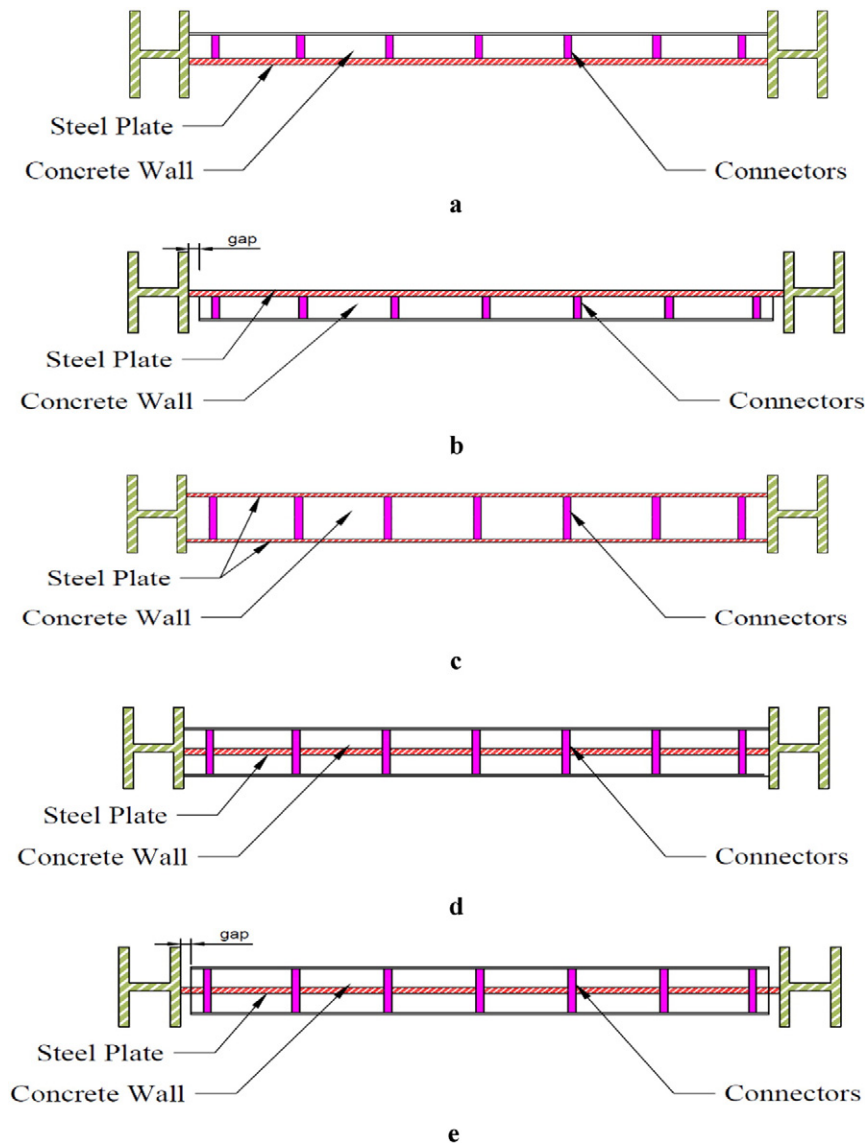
Composite shear wall systems: a) concrete on one side, b) concrete with gap on one side, c) concrete cast on steel plates, d) concrete on two side, and e) concrete with gap on two side.
